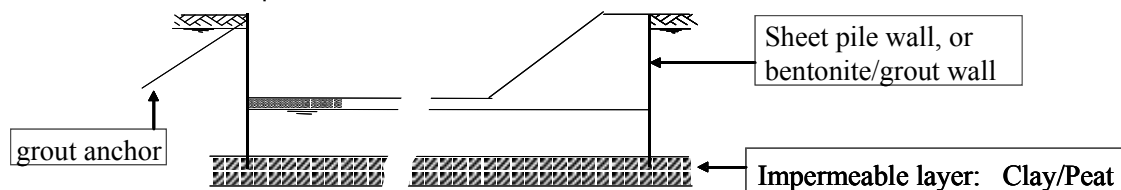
The use of a natural sealing layer (Cofferdam - left; Construction pit - right)
